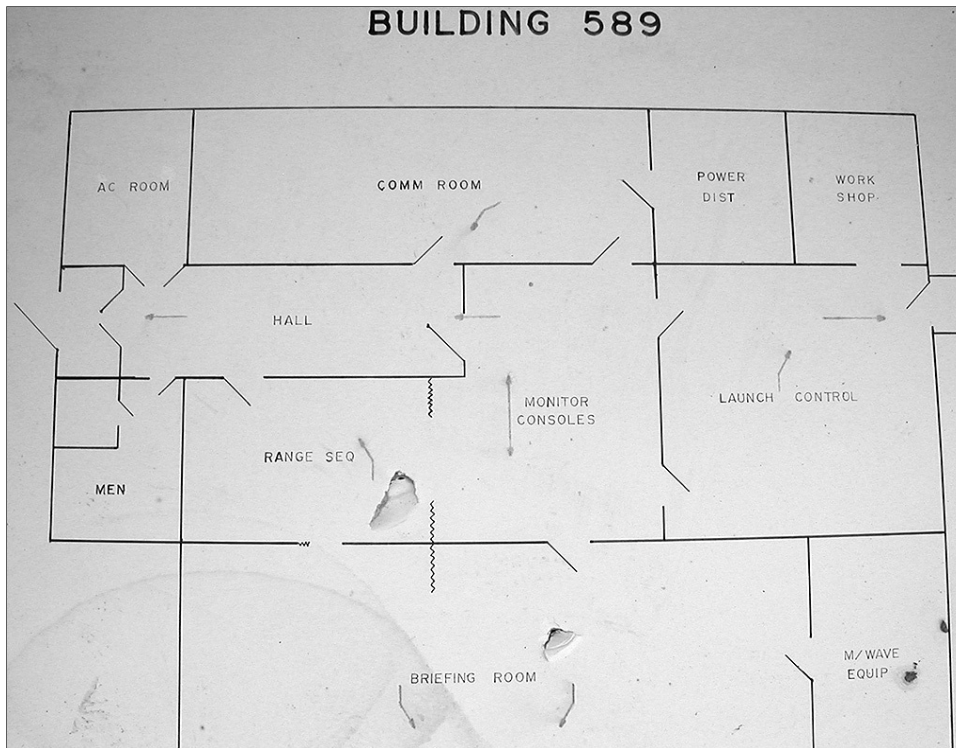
Blockhouse fire evacuation plan showing 1994 configuration, 2008 (ERDC-CERL).
